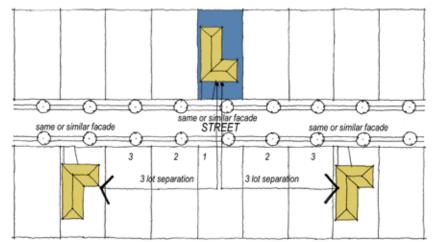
BUILT FORM VARIETY TO OPPOSITE SIDE OF STREET
